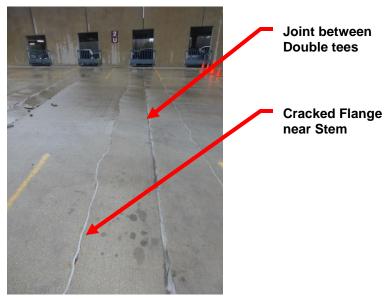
Longitudinal cracks at adjacent double tee flanges
